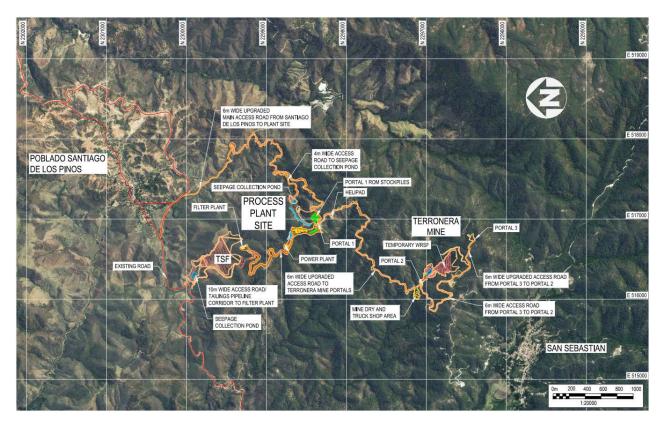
Terronera Site Layout (prepared by Wood QP, dated 2021)
